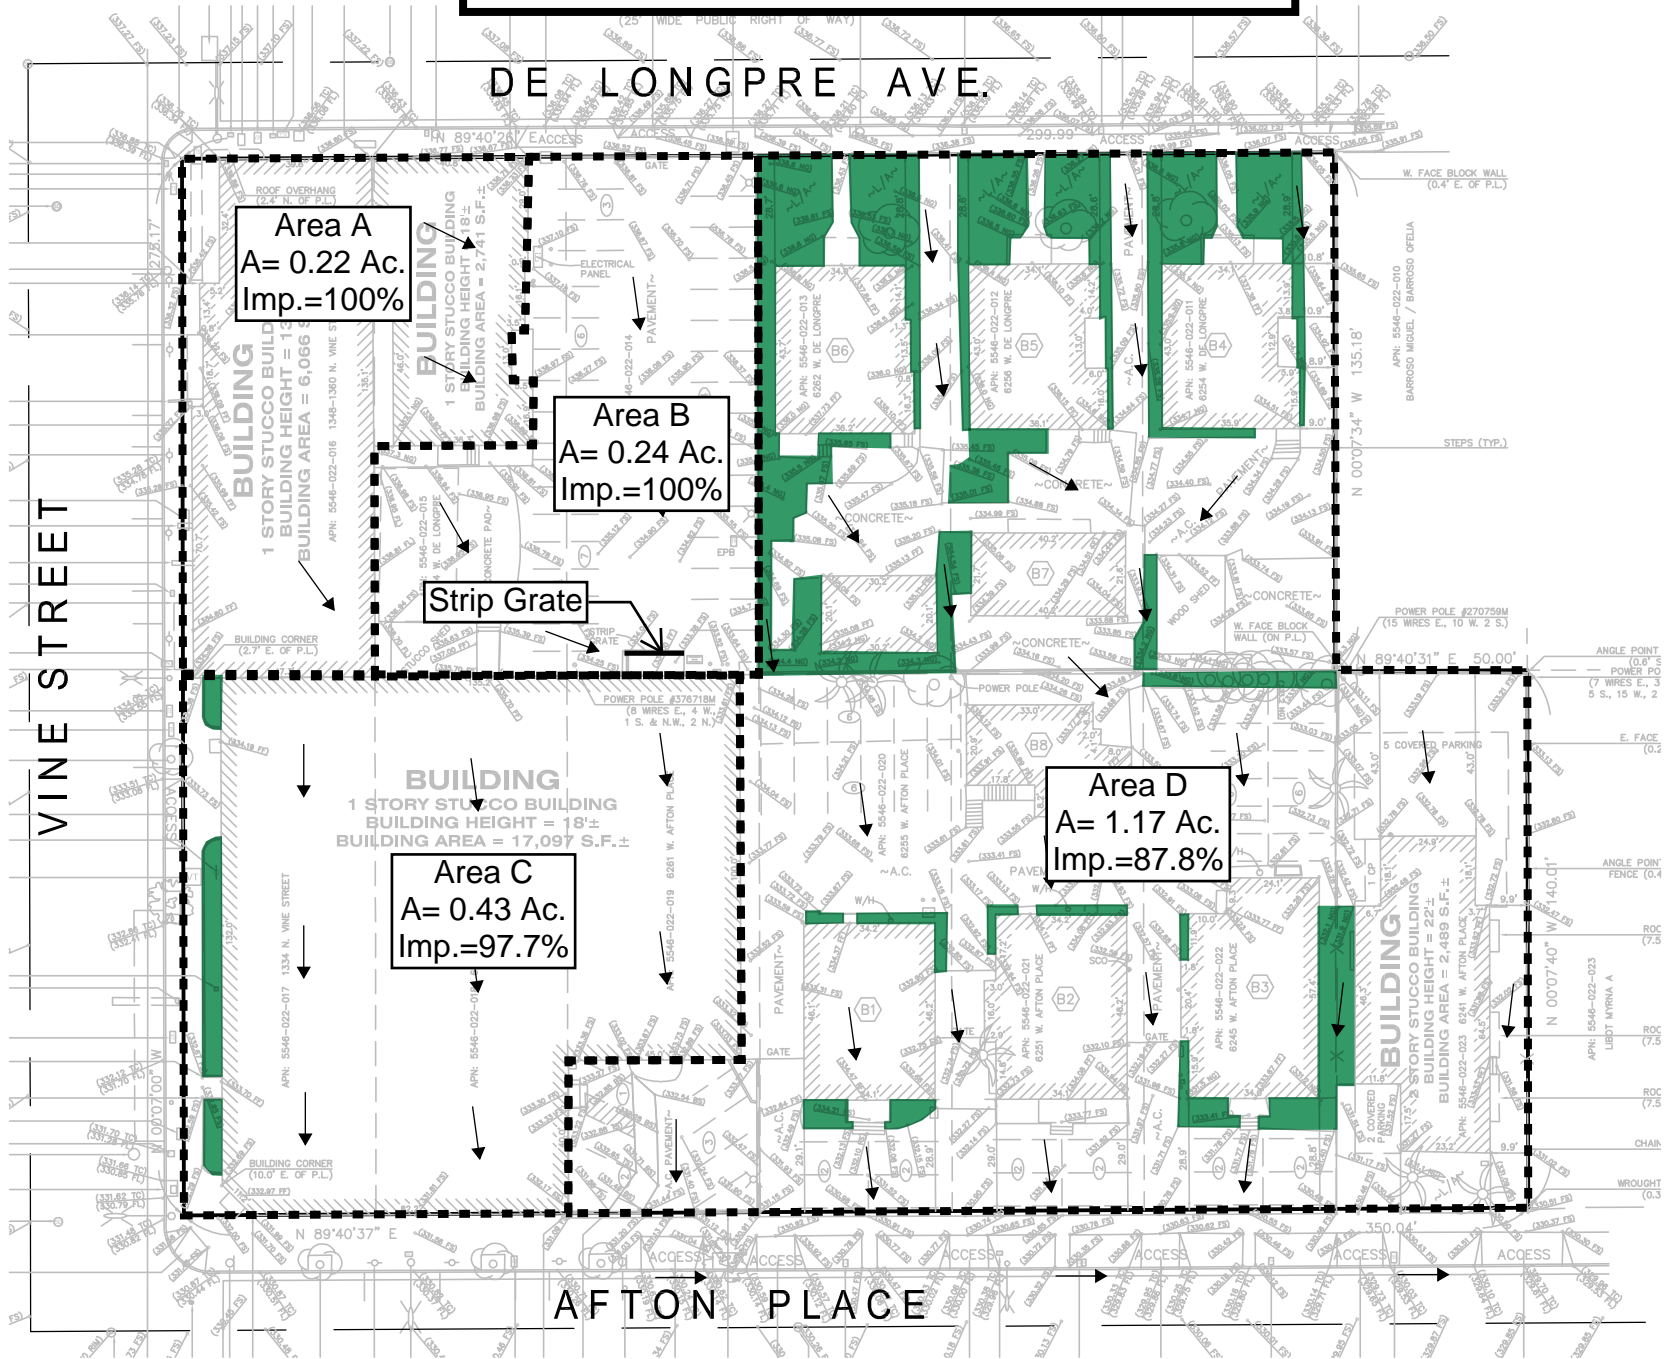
PROPOSED ON-SITE DRAINAGE PATTERN
